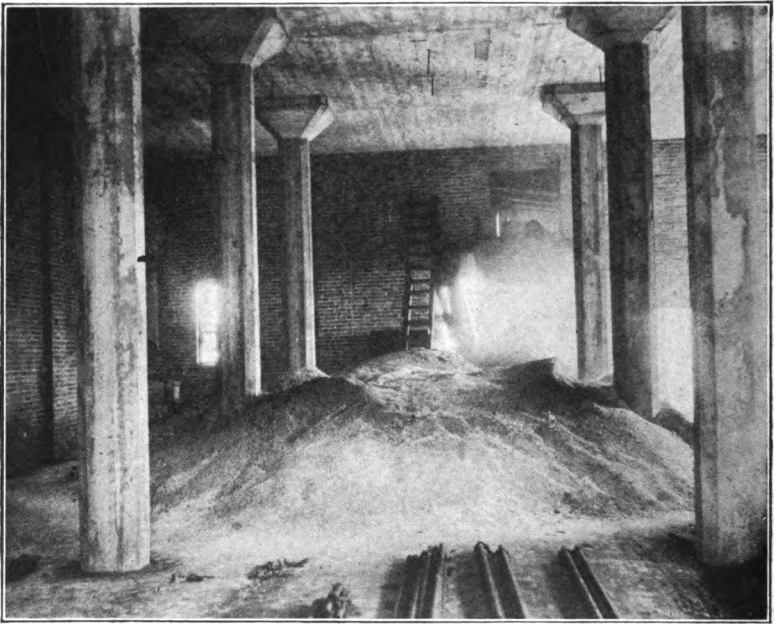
Reinforced Concrete Flat Slab Construction for 400 Pounds Per Square Foot Live Load, "C & S Type"
